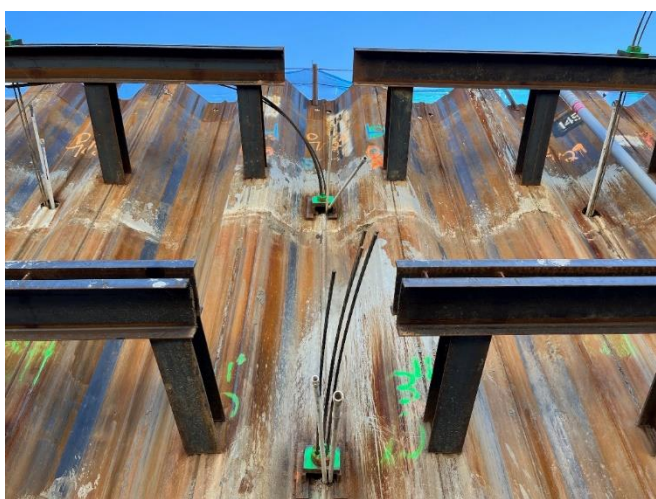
Sheet pile wall with relatively uninterrupted vertical seepage path
